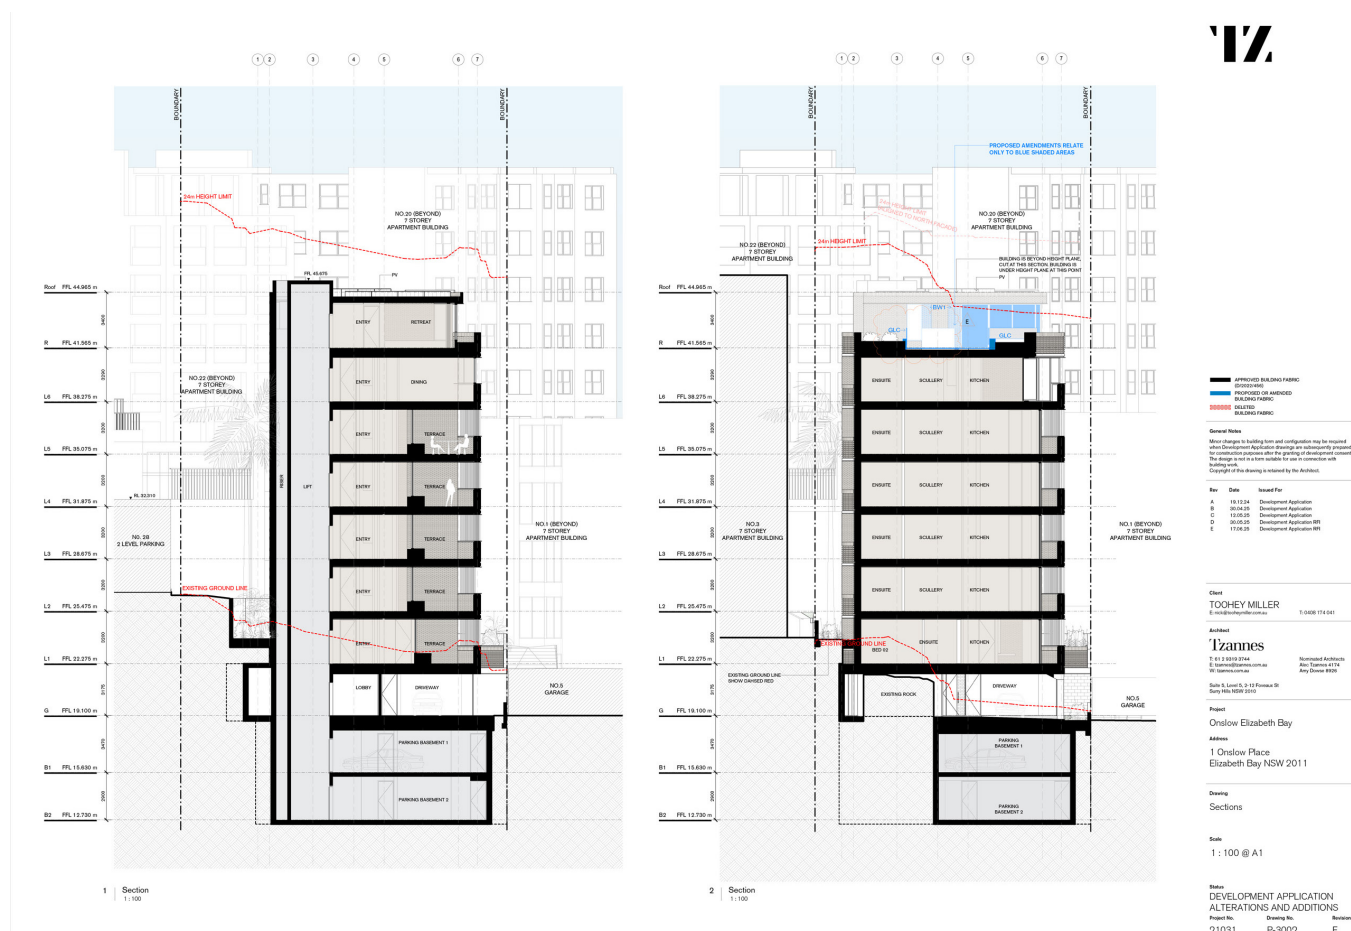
Typical sections through the proposal. Tzannes Architects.
